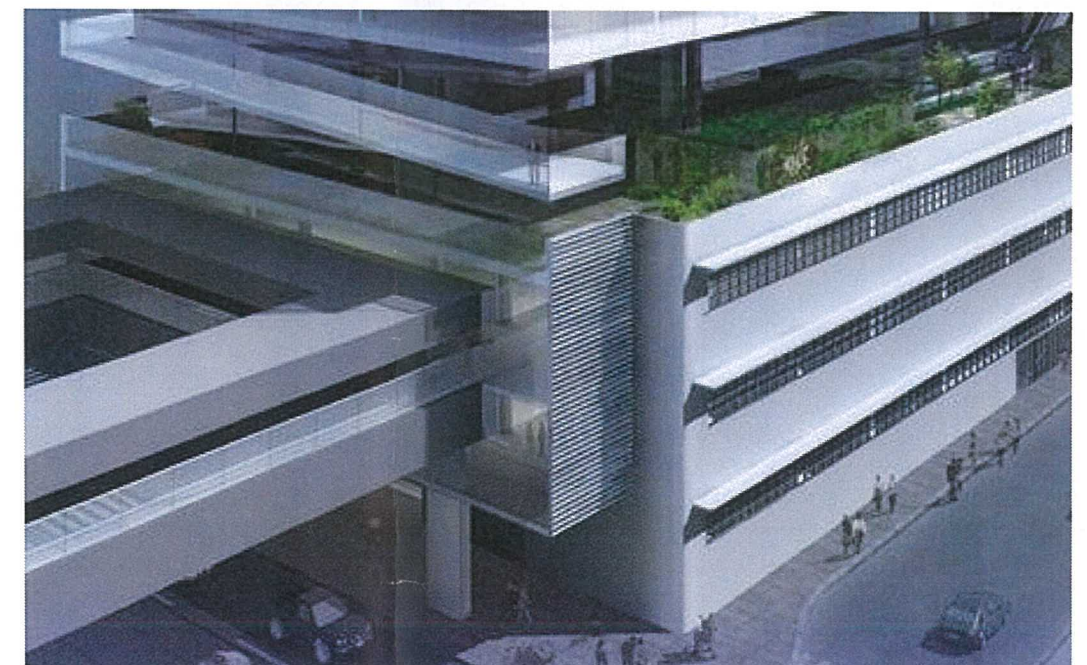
Similar Facade Design Approach in Previous S.16 Planning Application (No. A/H4/92) Approved by TPB on 19 July 2013
